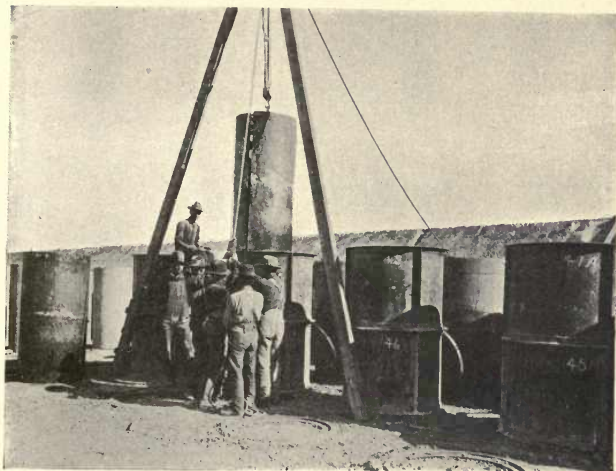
Removing Inside Steel Forms from Concrete Pressure Pipe, Boise Project.
